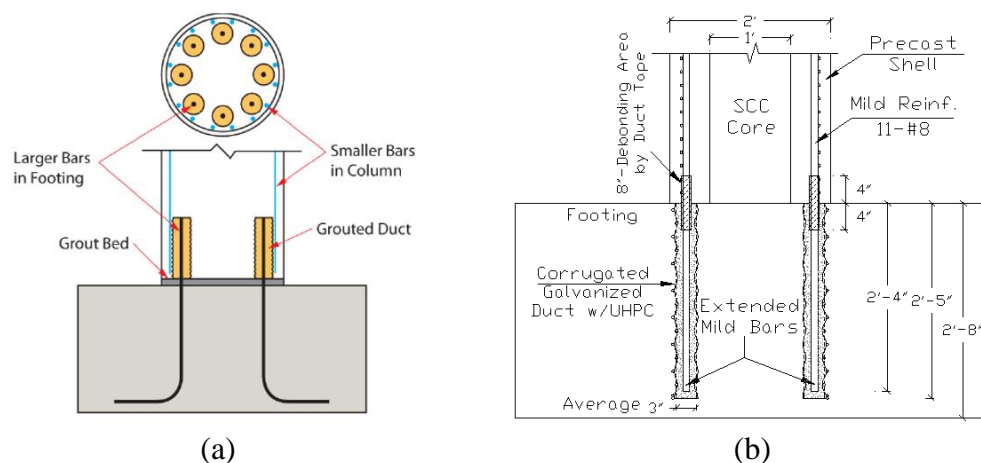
Column-to-footing connections with grouted ducts: (a) large bars with ducts Cast into column and (b) ducts placed in footing with UHPC infill
